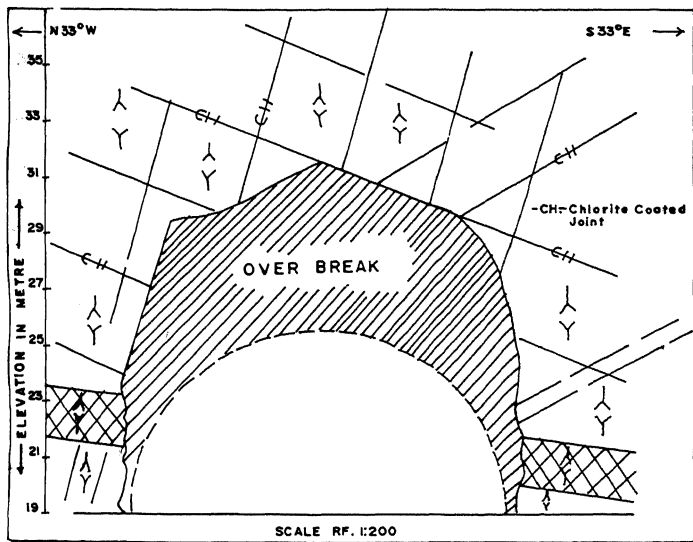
GEOLOGICAL CROSS SECTION OF EXIT TUNNEL-1. RD.79 m. (FOR INDEX REFER FIG.3)
